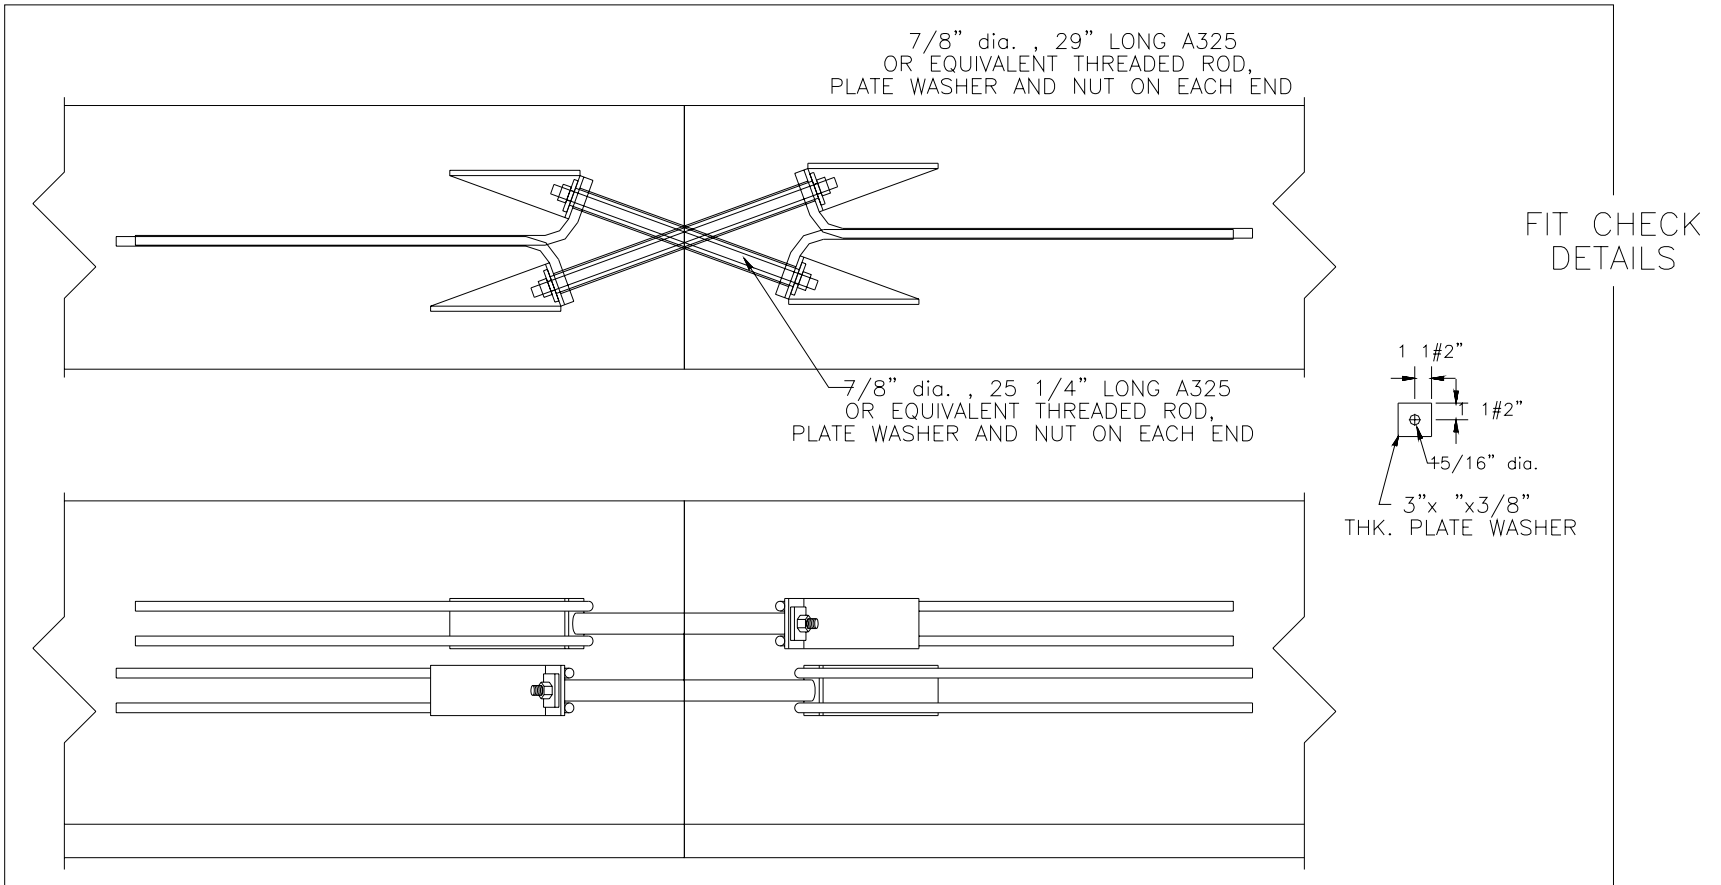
Fit Check Details of the Cross-Bolt, F-Shape Precast Concrete Traffic Barrier.
